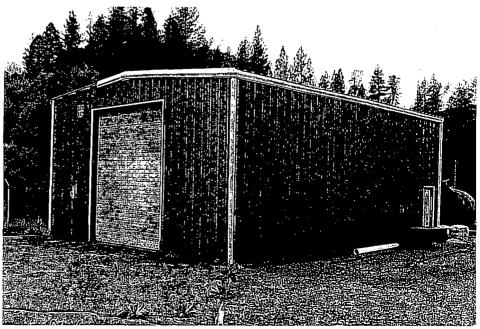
STEAM FIELD CONTROL CENTER BUILDING
